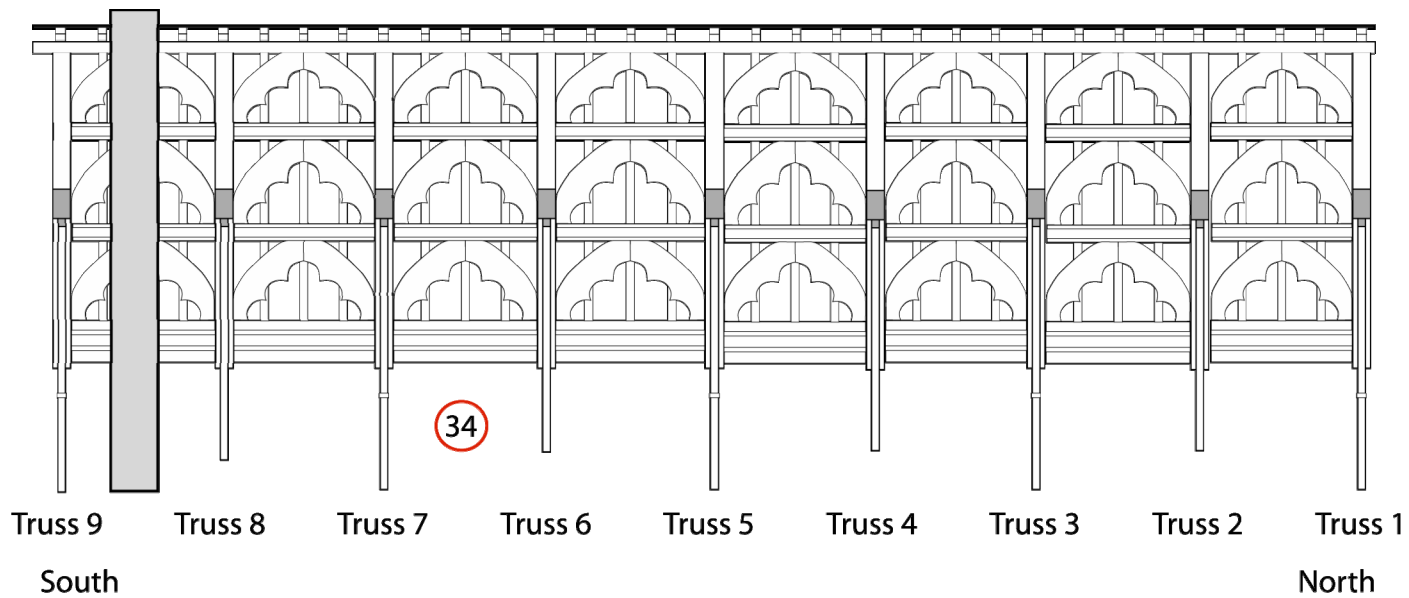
Long section looking west to show sampled timbers (after Marius Barran)
